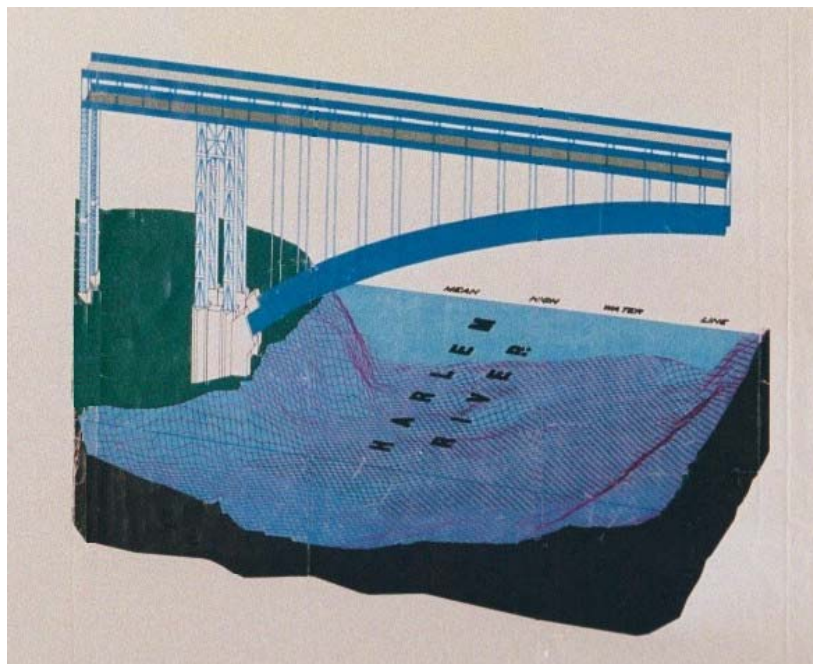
Triborough Bridge scour survey (Lichtenstein Engineering and Innerspace Technology)
